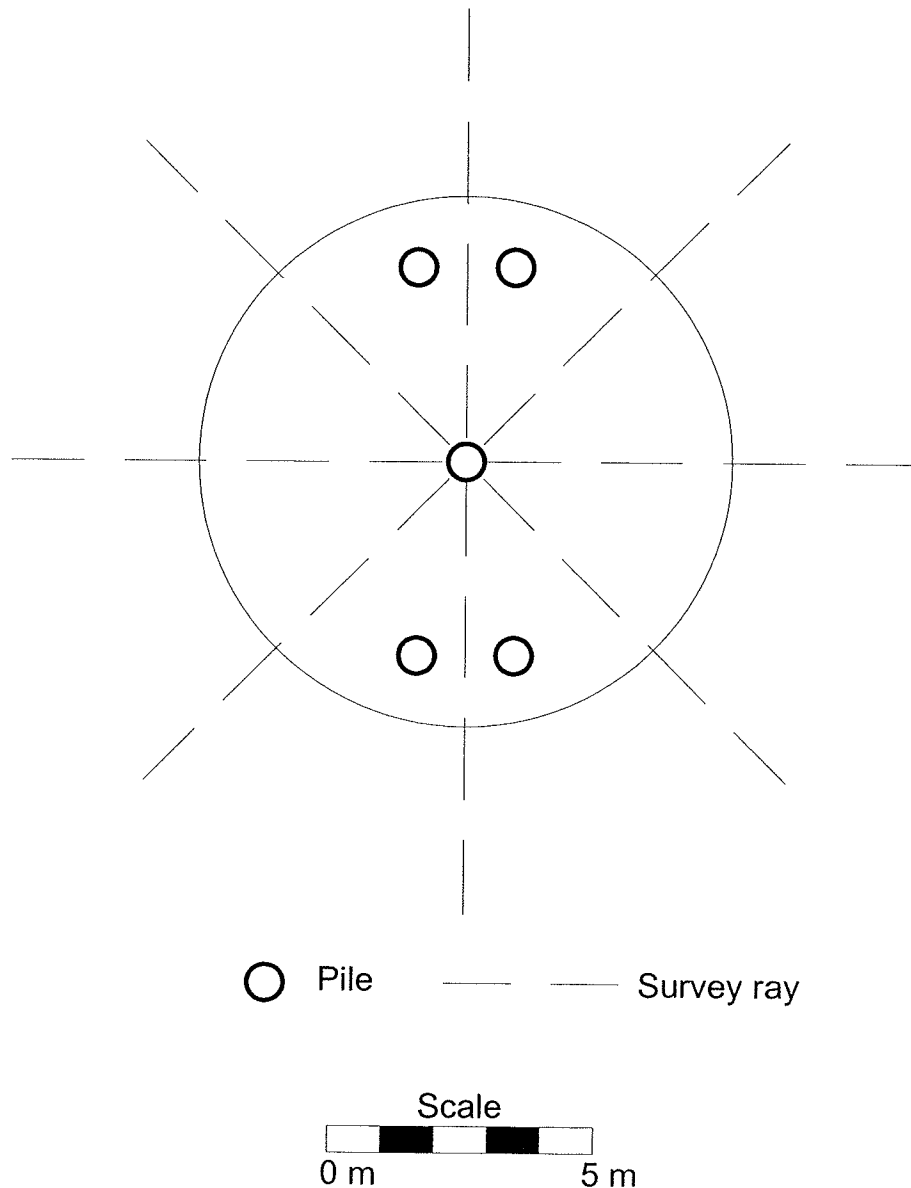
Plan view of pile foundation installed at both Sites 2 and 3.
